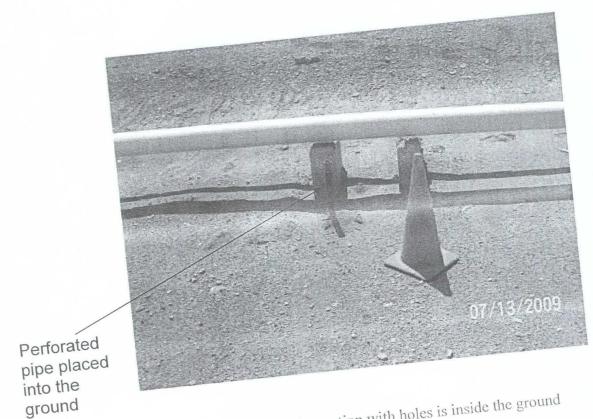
Photograph of emplaced pipe – the section with holes is inside the ground
